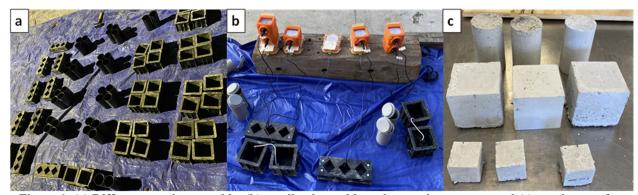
(a) Different specimen molds; (b) small cube molds and maturity sensors; and (c) specimens after being removed from the molds.
